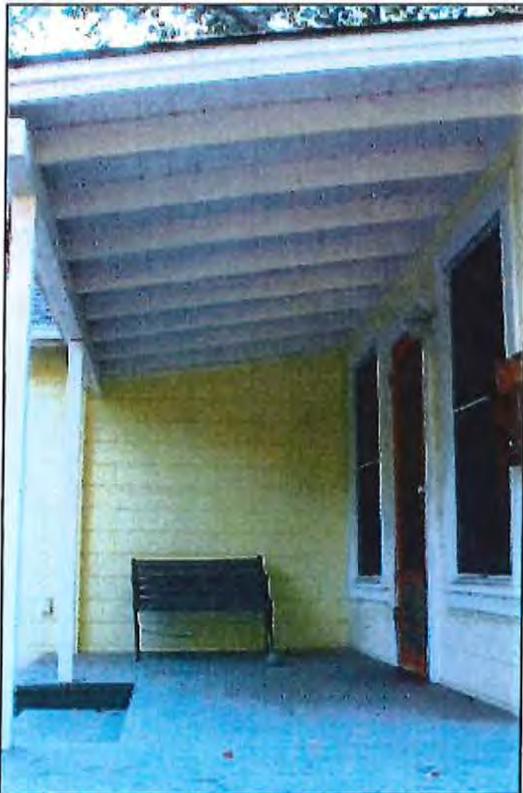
Back porch looking at east side of kitchen addition. Figure 21: South (rear) elevation. Kitchen wing.
